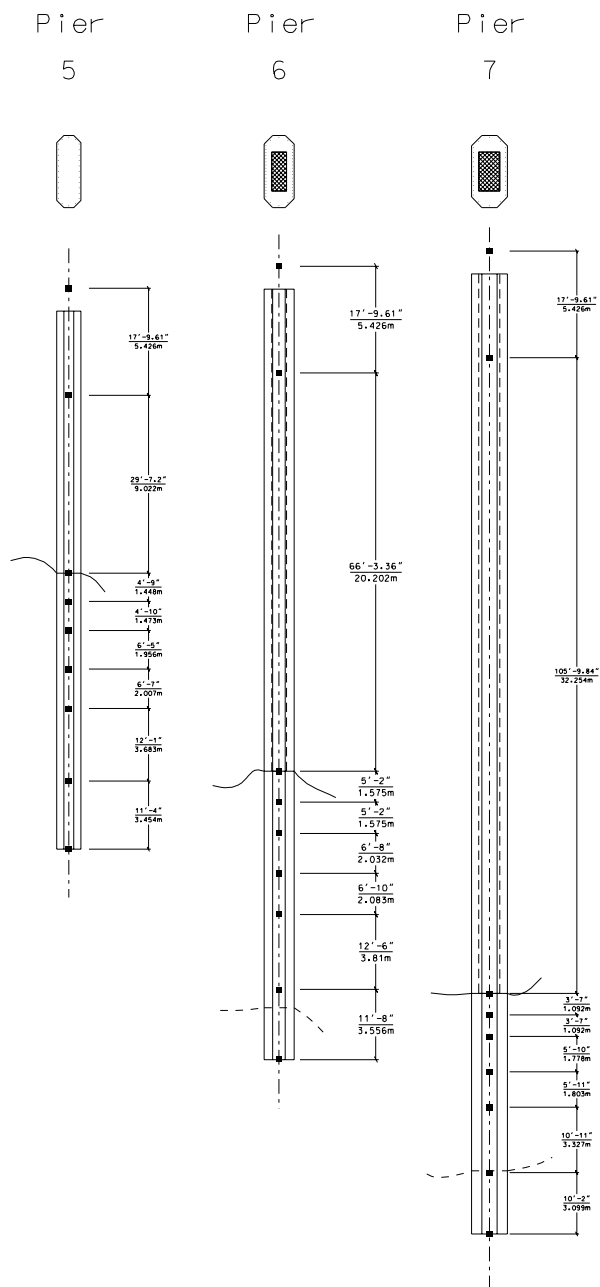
Node Locations in Column Elements for Piers 5, 6 and 7
